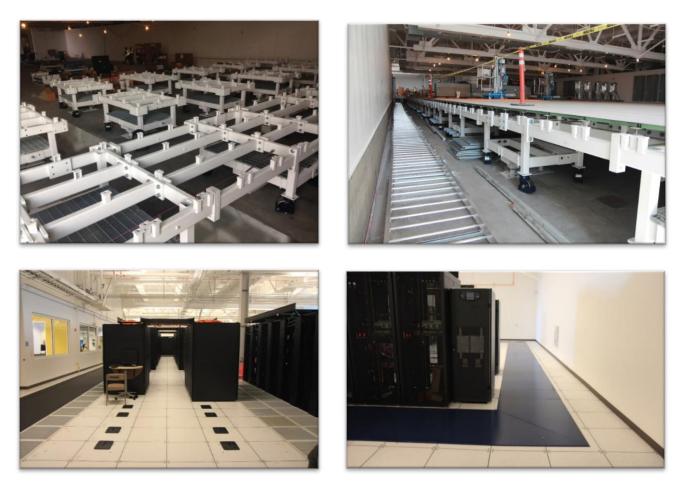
(a) Individual modules placed and being connected with stringers, (b) floor tiles installed on the frame, (c) Completed Floor with super computers, and (d) Seismic gap covers around the perimeter.
